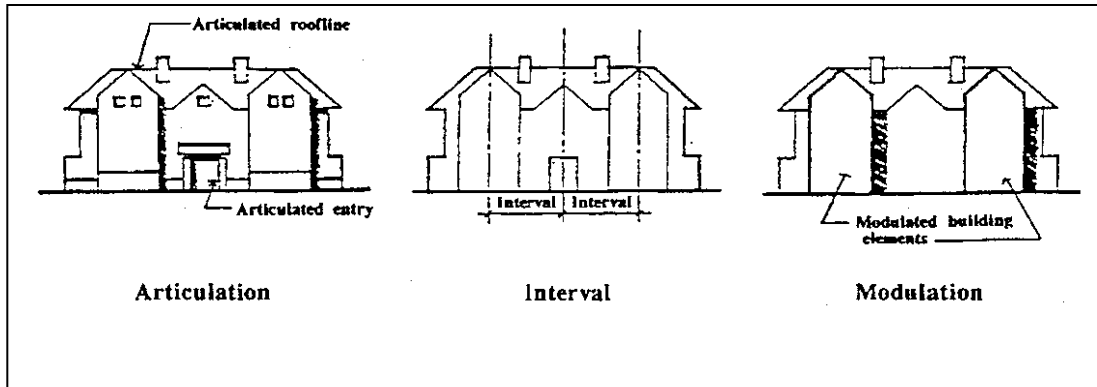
Architectural terms used to describe building massing concepts.
